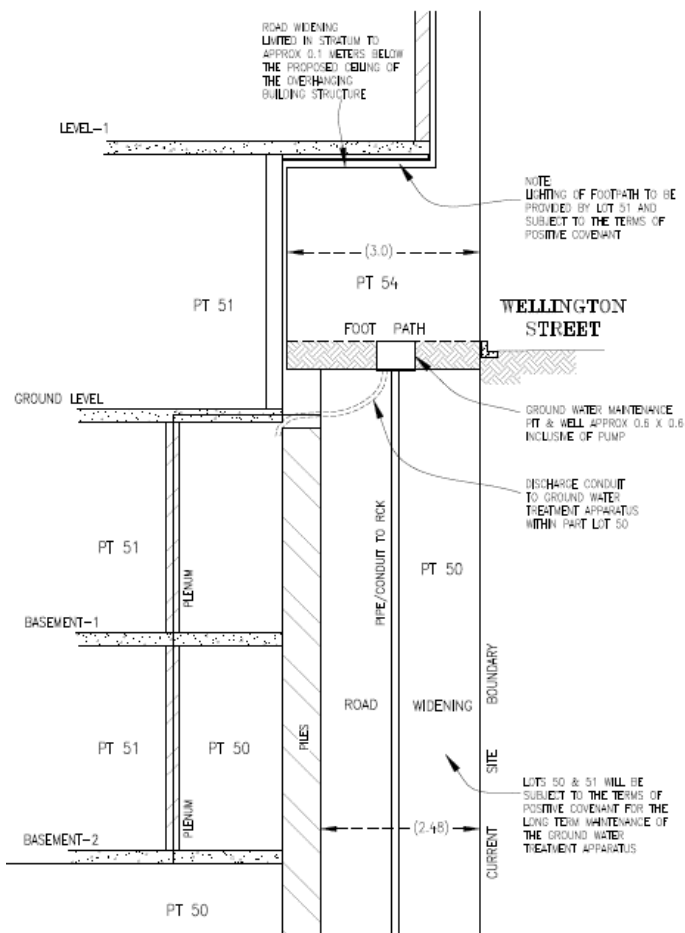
An extract of the proposed stratum arrangements in Wellington Street.
